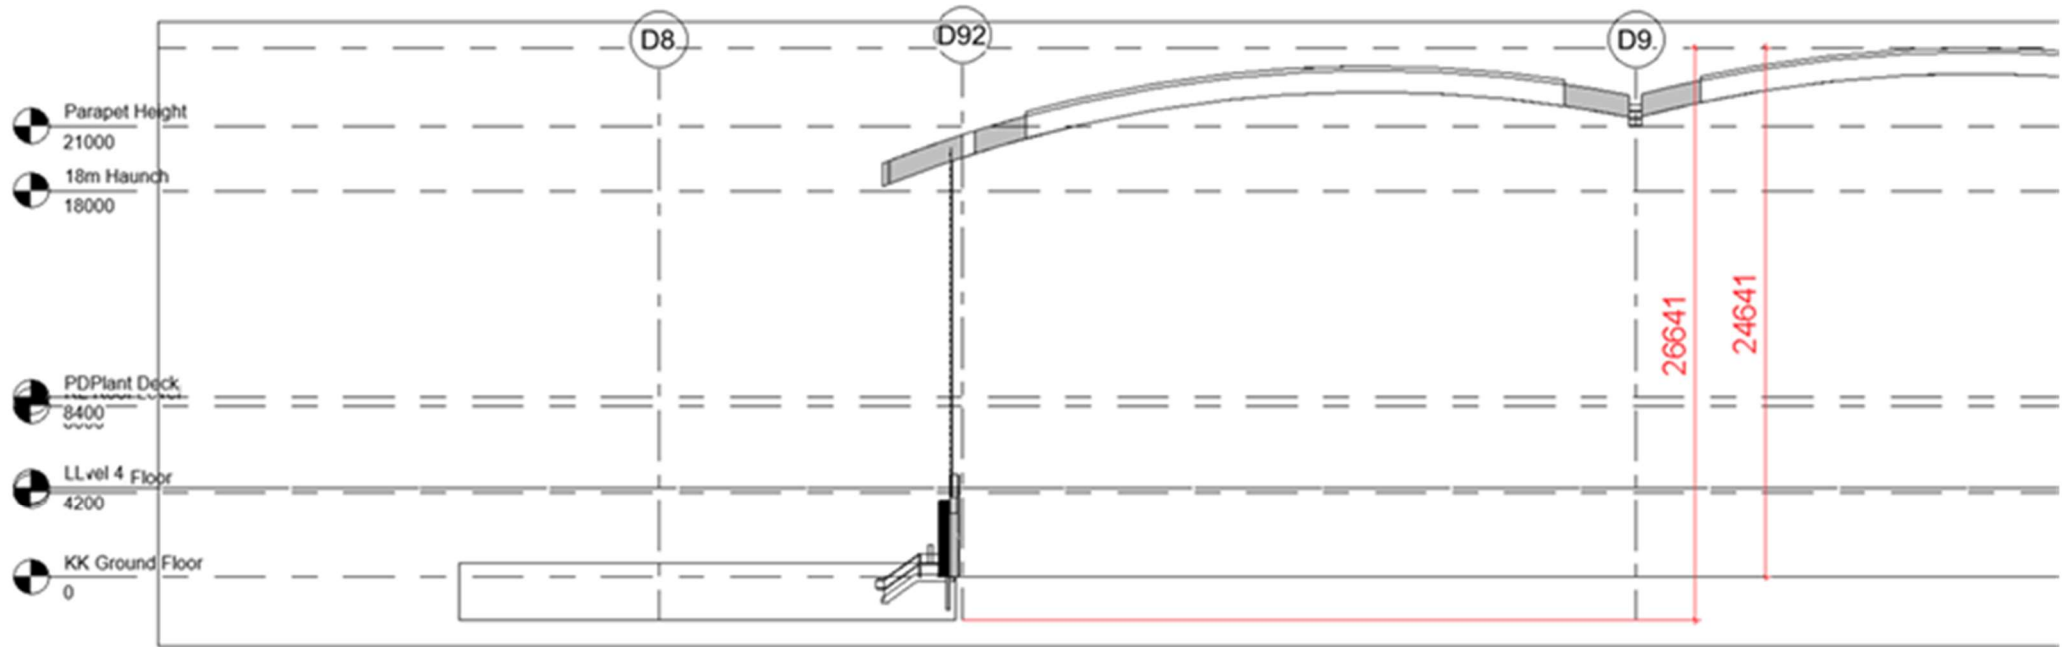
Cross section of the architect's 3D model as used in the Type 3 Photomontages. Ridge height from ground level is 24.641m, with parapet height at 21 metres above ground level.
